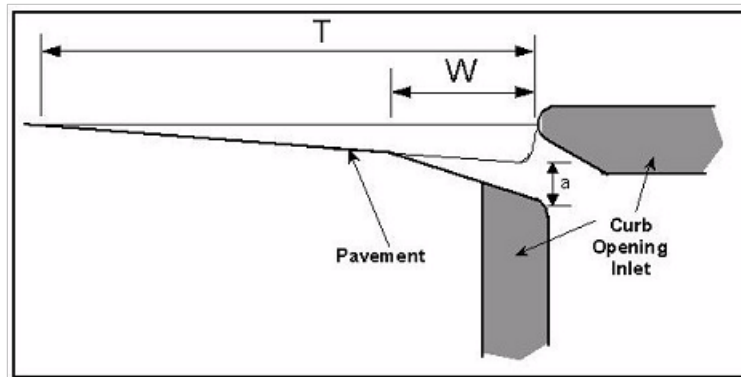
Curb Opening Inlet Drain (TxDOT 2018)
